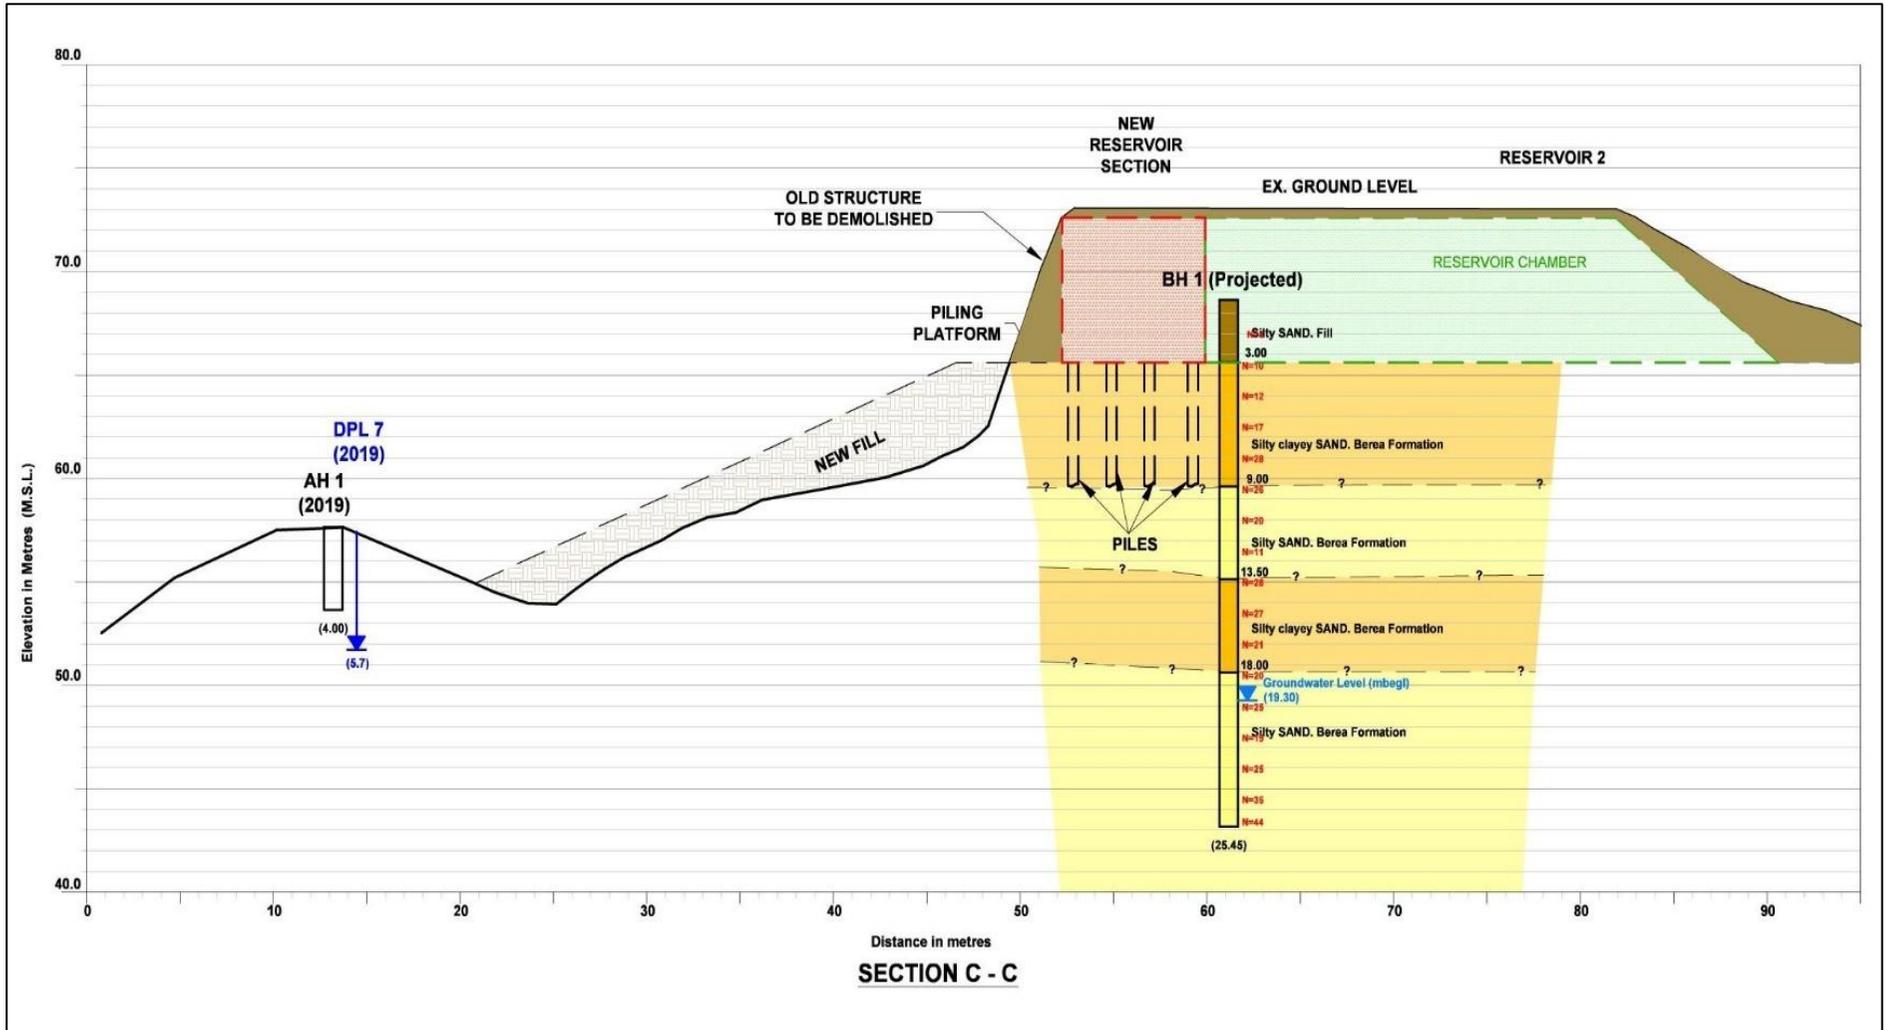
Section C-C: Construction of new fill embankment near the western corner of Reservoir 2 will stabilise the eroded / damaged platform and provide piling platform
